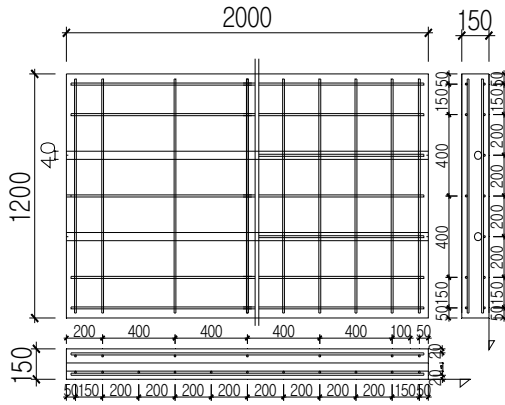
Slab specimen (arrangement of reinforcing steel)
